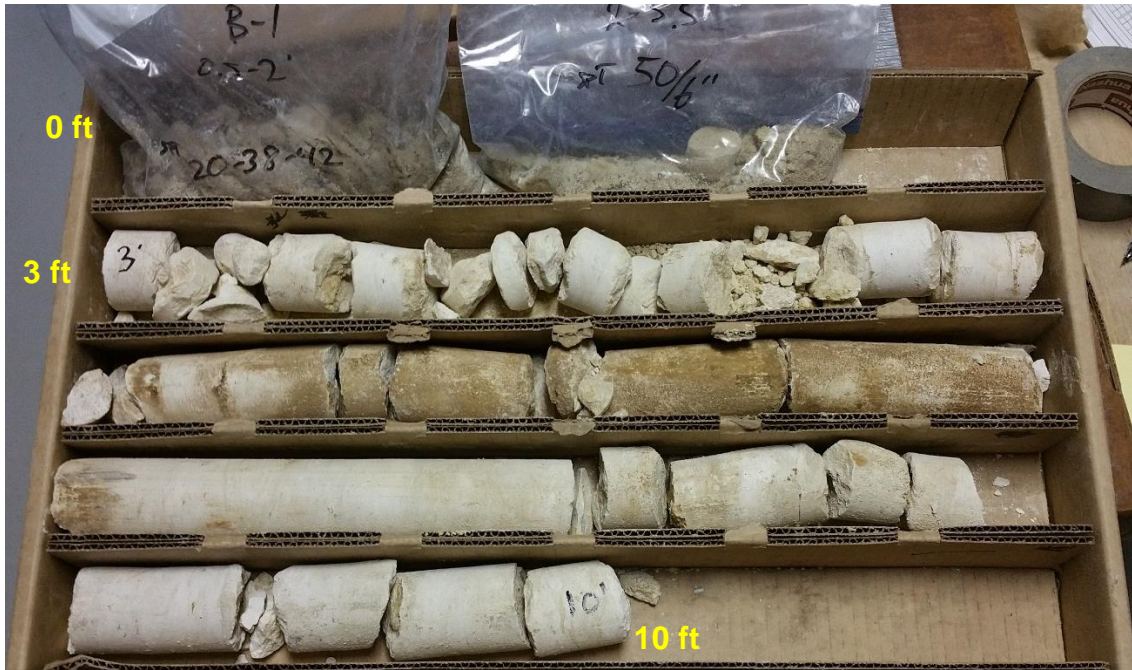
Boring B-1 soil and limestone samples from 0 to 10 ft
